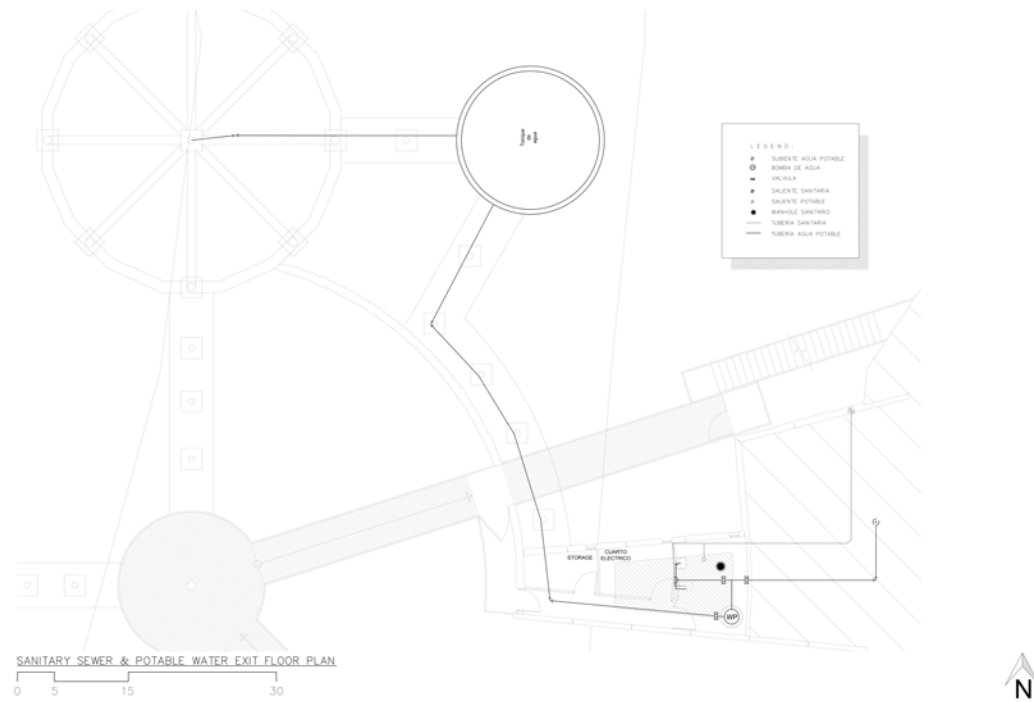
Sanitary Sewer & Potable Water Exit Floor Plan. Diagram by student Reinaldo E. Hernandez Arcena.
